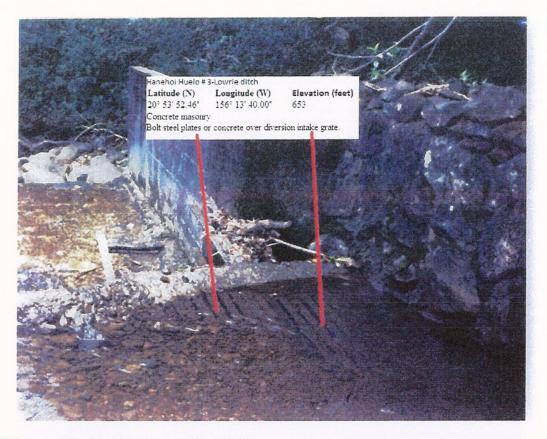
(above): Hanehoi #3 at Lowrie Ditch (L-7)
